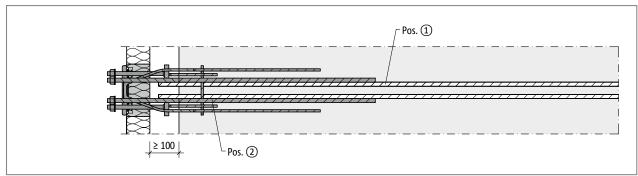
Schöck Isokorb® T type SK-M1: On-site reinforcement for semi-precast construction: Plan view
